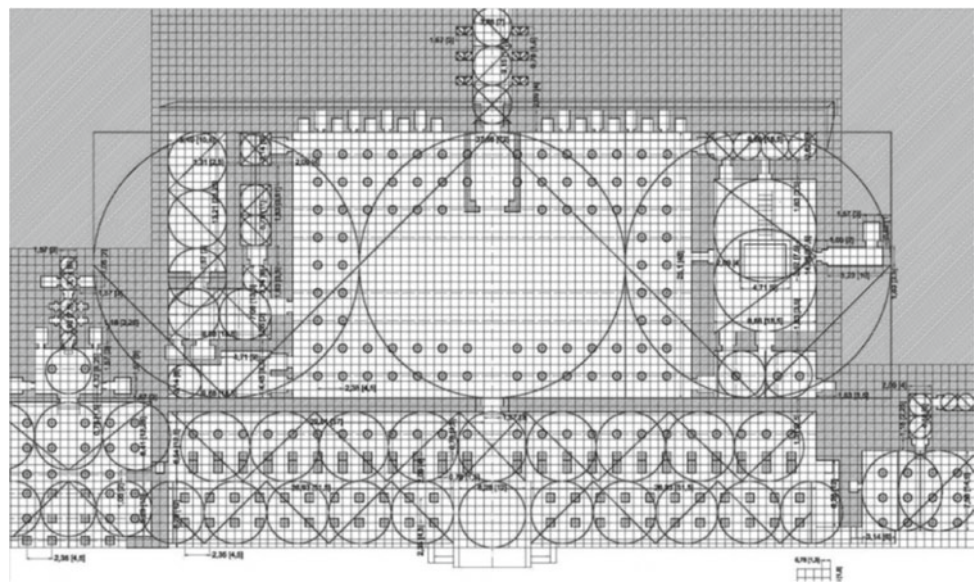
Temple of Deir el Bahari, floor plan, regulatory geometry
